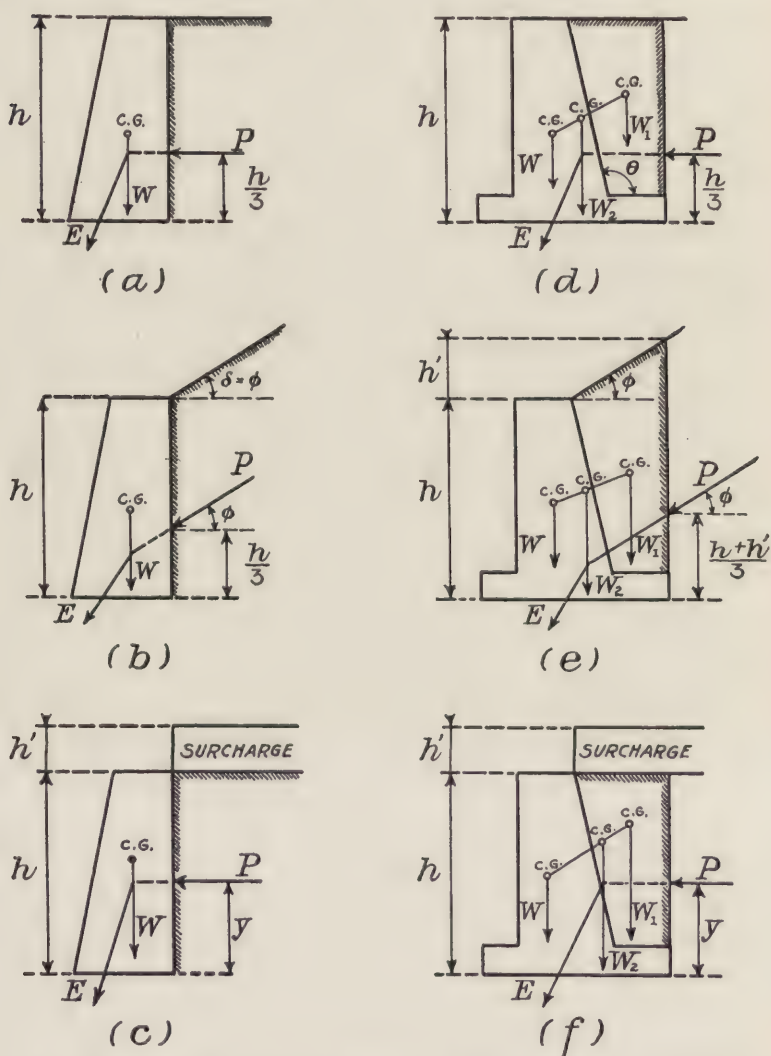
Six Typical Gravity Retaining Wall Sections and Loadings.
